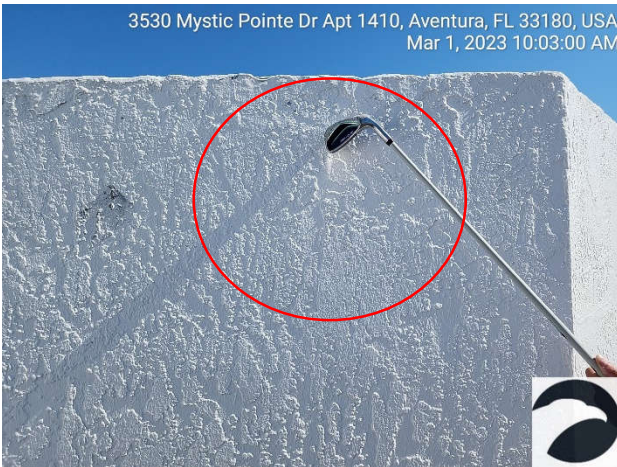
c.27– Delaminated stucco, hollow sound at parapet wall (Roof Level)
